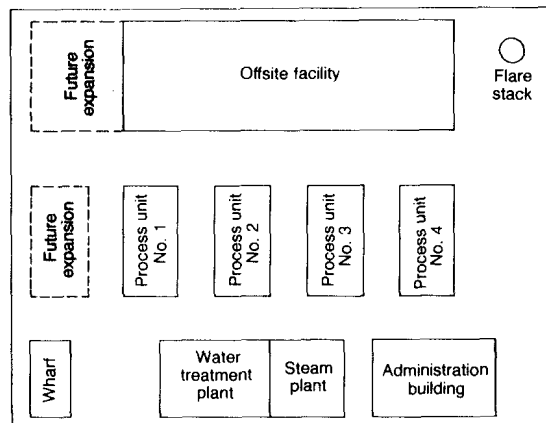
Site plan of the hypothetical plant for which steam system is being designed
